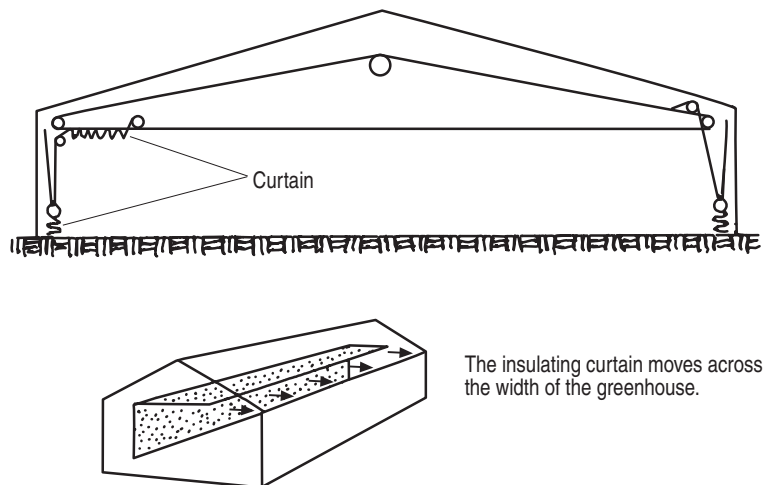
Cable-supported blanket system for gutter-connected greenhouse
